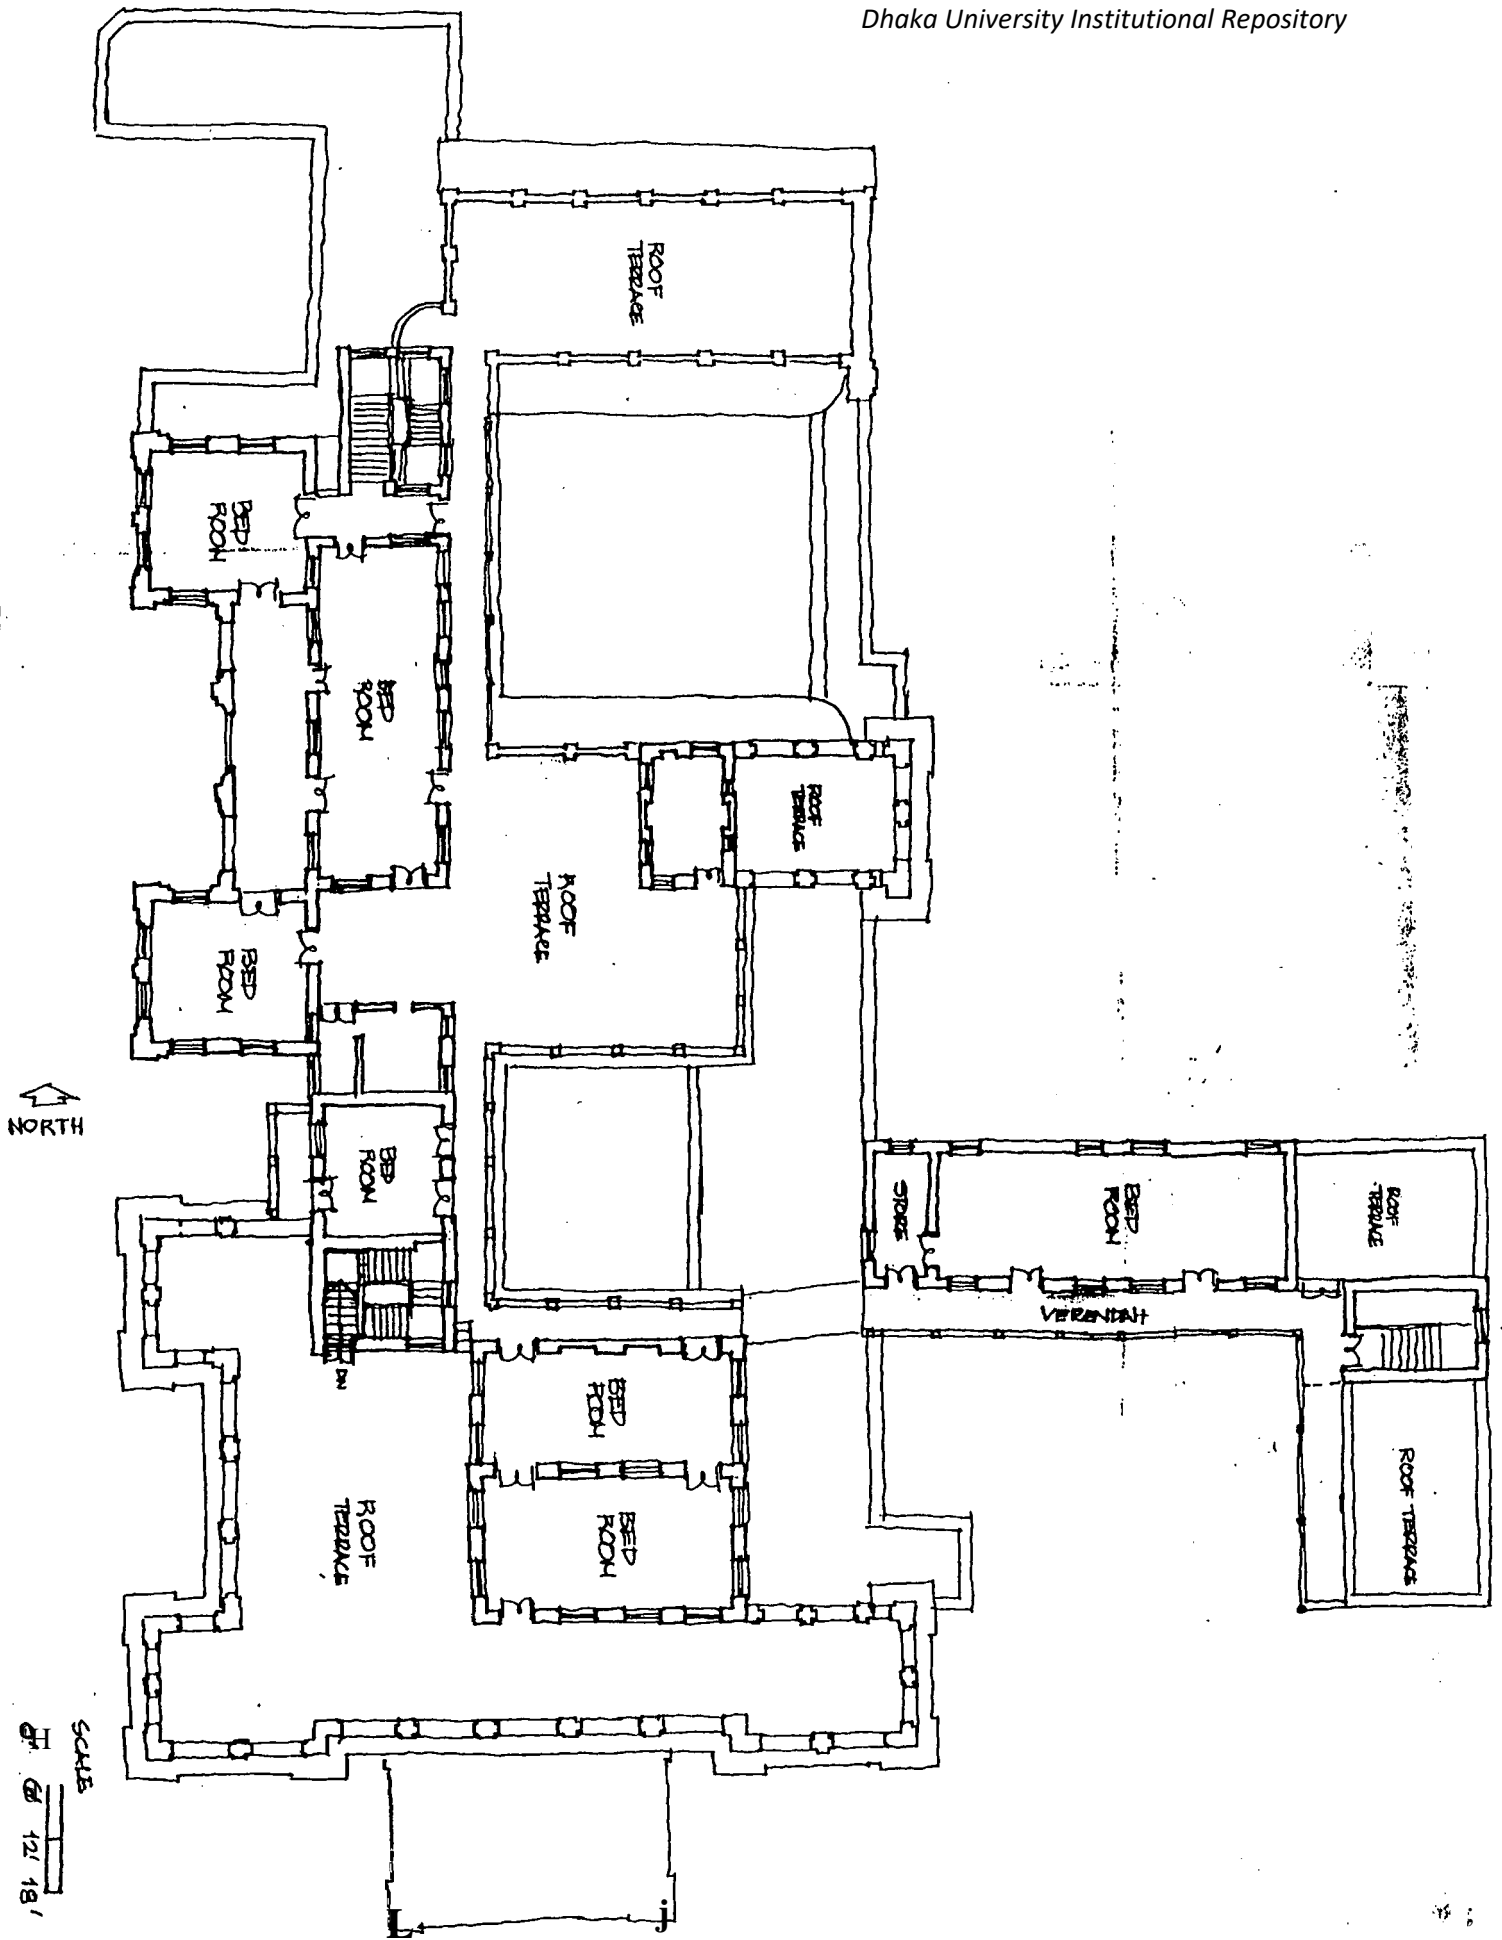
Second floor plan, Rebolu Mohan Lodge, Sutrapur, Dhaka
